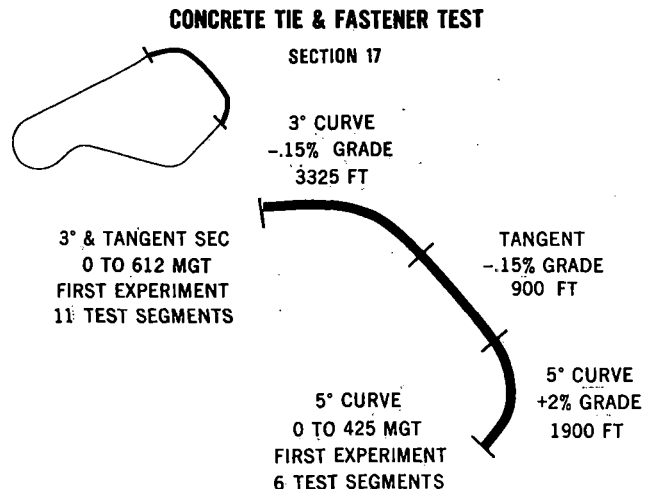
CONCRETE TIE AND FASTENER TEST.
